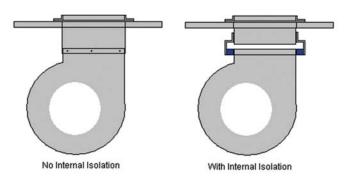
Contact Service Parts for a Duct Extension Kit
